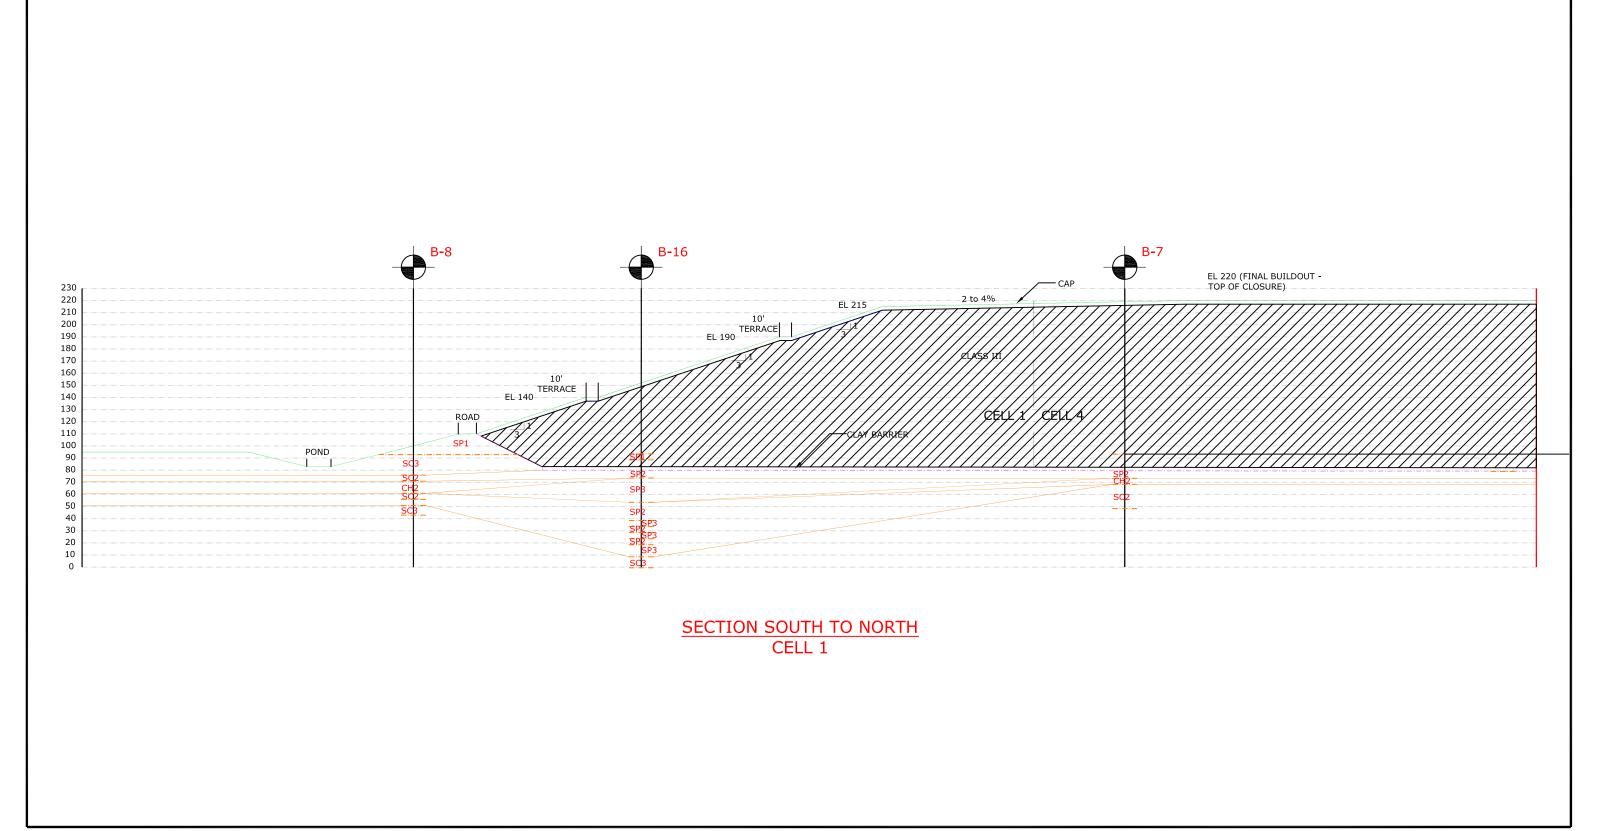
CELL 17 EXPANSION, CELL 1 SLOPE STABILITY SECTION
